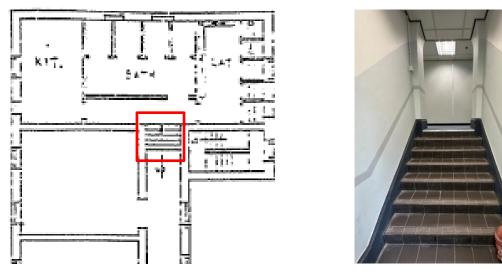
Stair above mezz.floor at 1/F before 1949 plan (left) [ArchSD modified by author] Single flight stair at 1/F 2023 (right) [by author]
